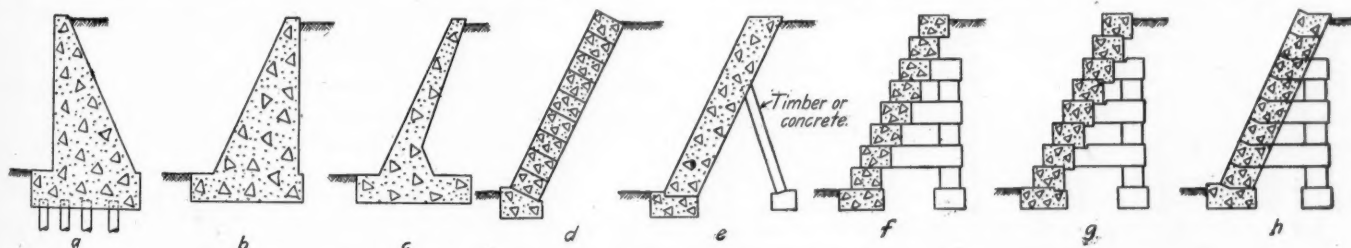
Various Types of Retaining Walls Considered for Use on Soft Foundations
